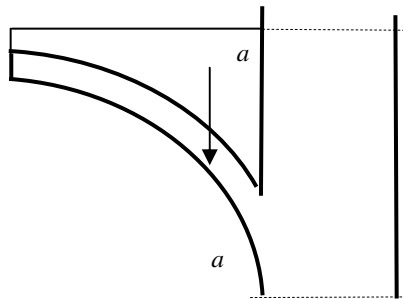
Cracking pattern detected in the middle section of a gypsum model of a flight of stairs, by Lenza, (1983)
